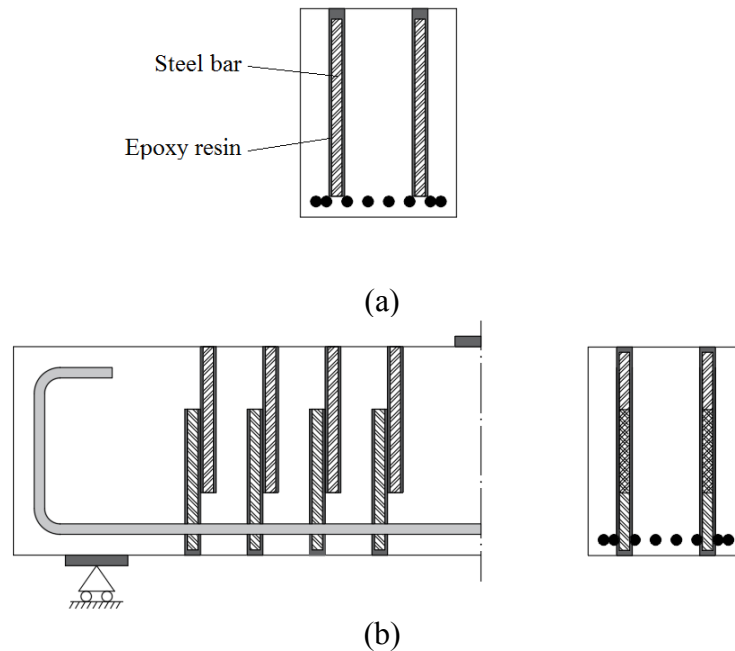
Overview of the two methods studied: (a) Cross-section of top-sided drilled in steel bars; (b) Section and cross-section view of double-sided drilled in steel bars, adapted from (Fiset et al., 2017).
